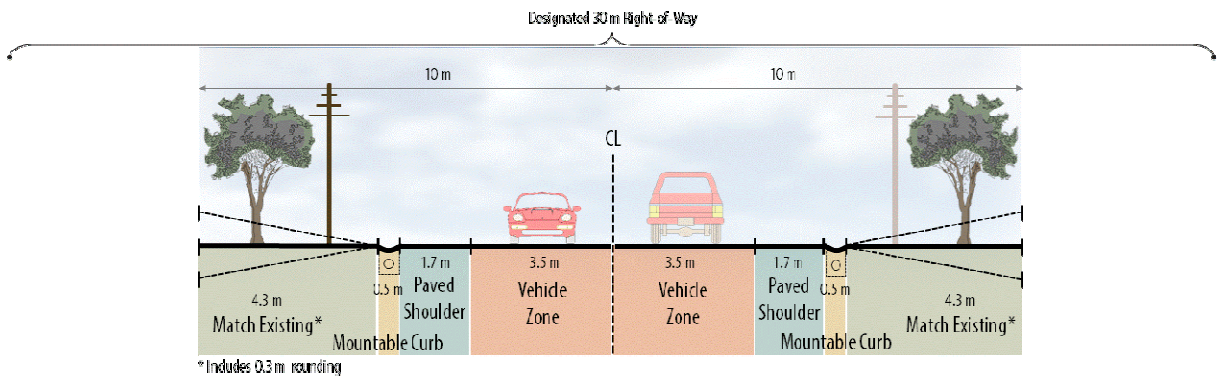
11.4 m Platform Semi-Rural Cross-Section for Olde Base Line Road
